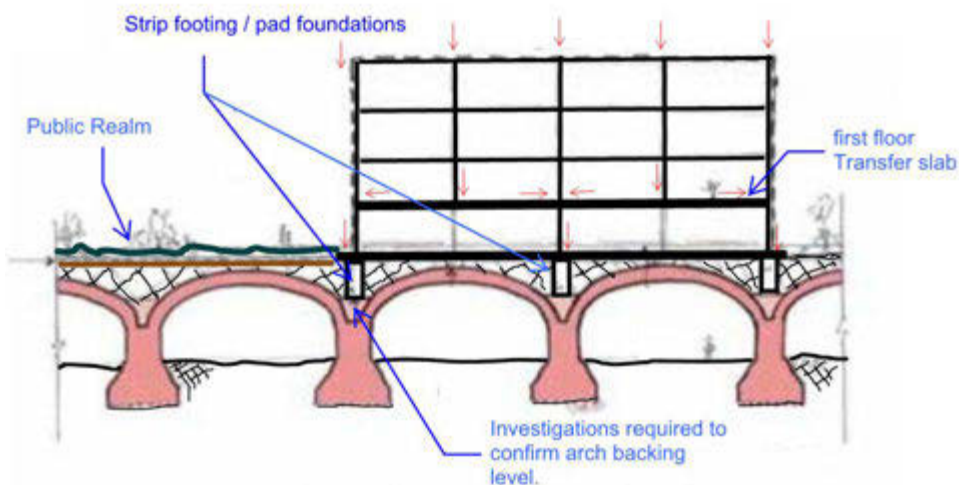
Proposed building frame arrangement spreading load on raft and strip foundations.
